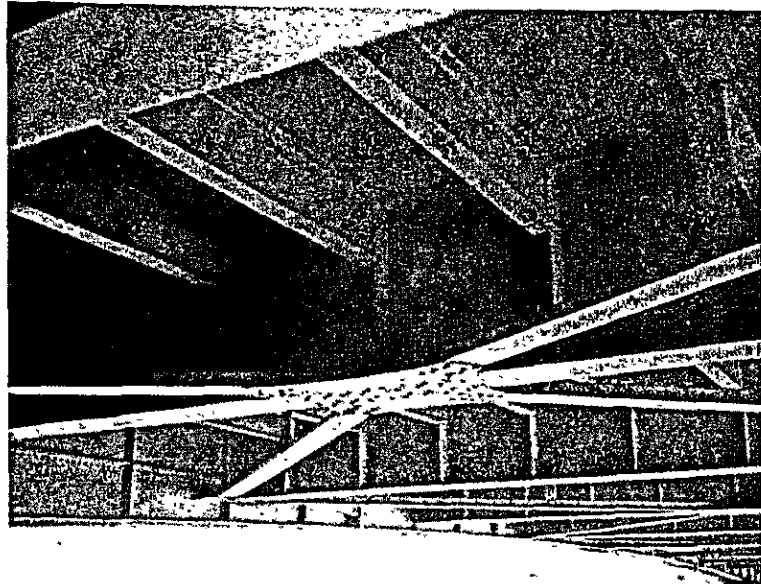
Stringer, Cross Beam and Lower Lateral
